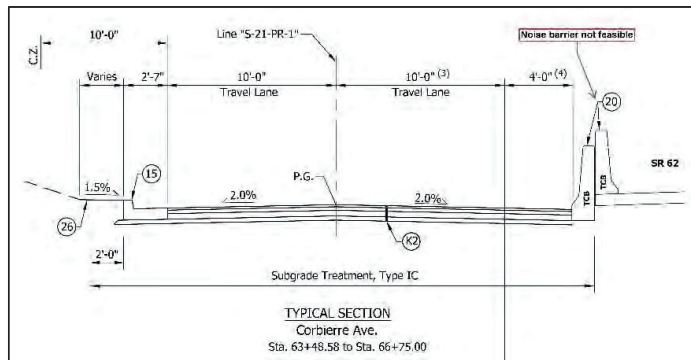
Corbierre Avenue typical section where noise barrier wall is not feasible east of Addison Avenue
